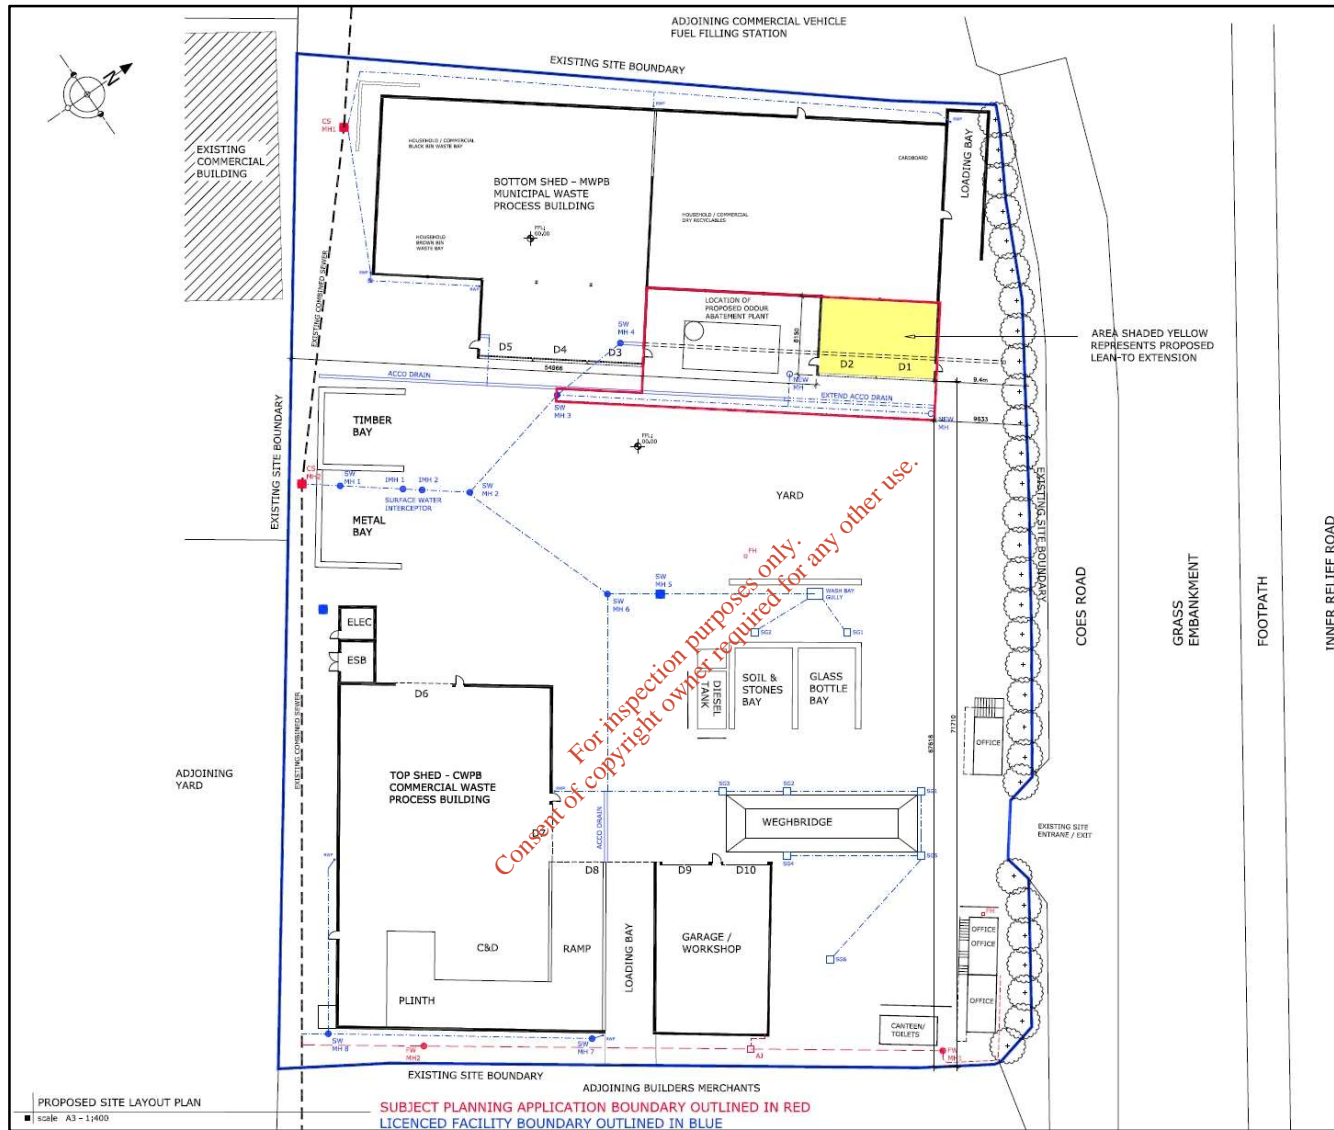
Site layout at Oxygen Waste Recycling Facility, Coes Road, Dundalk, Co. Louth.
